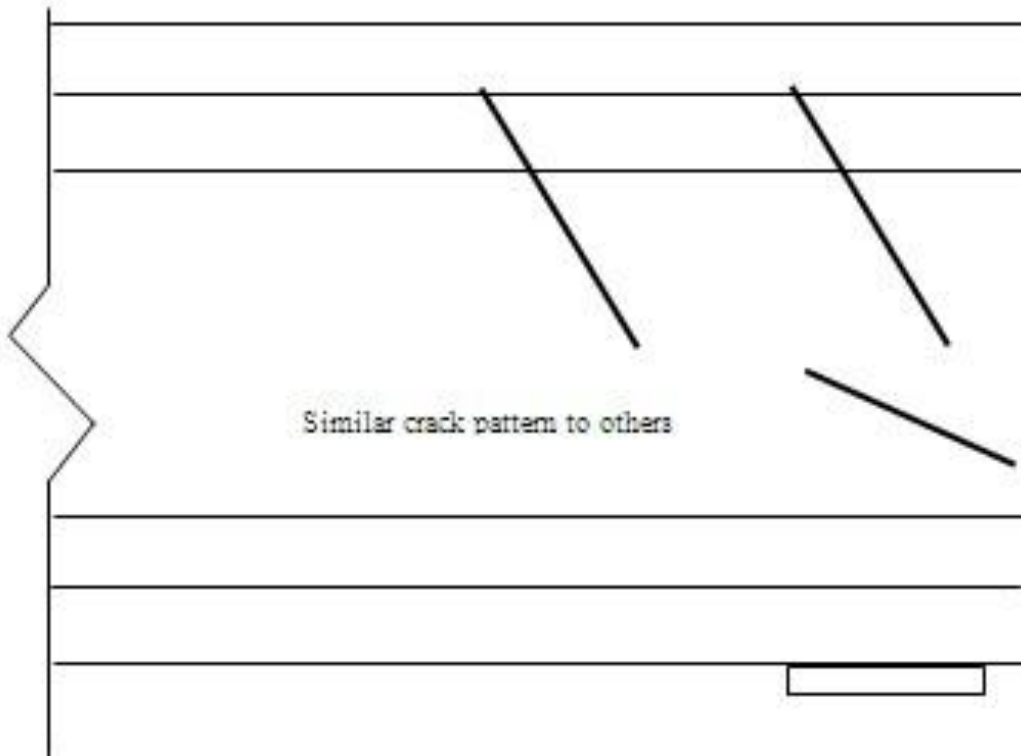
Crack diagram for girder 2nd from west side, east face, north abutment (#1830).
